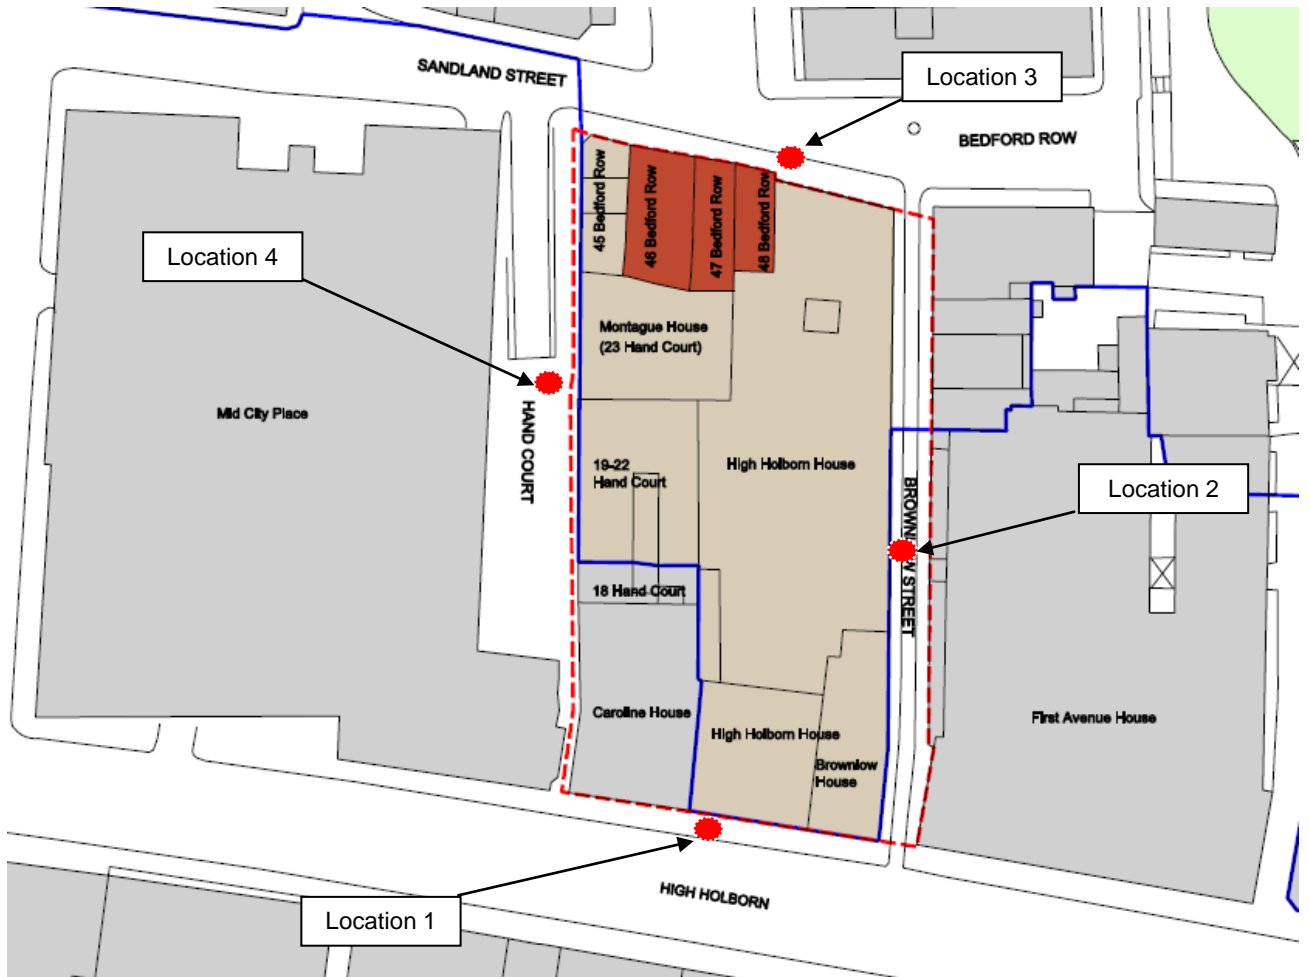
Existing Site Plan Showing External Measurement Locations
